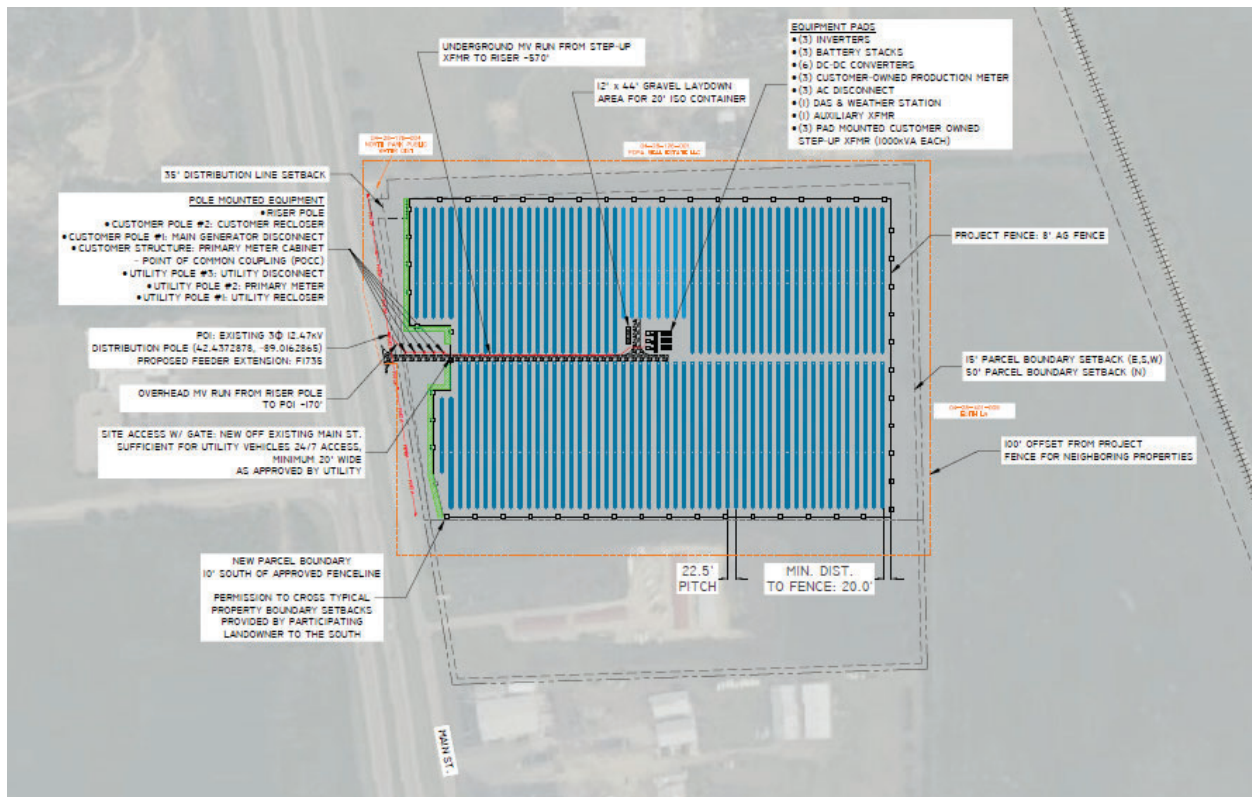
Pivot Energy IL 143 LLC Site Plan.
